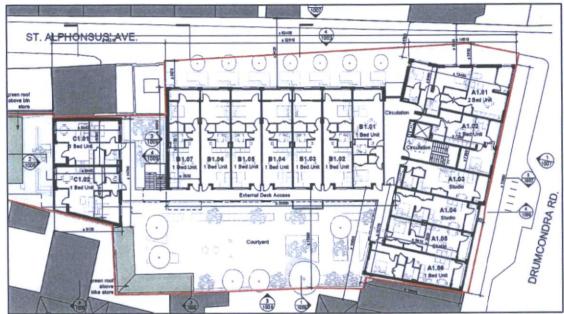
Extract from the First Floor Plan as Submitted with the Planning Application,
